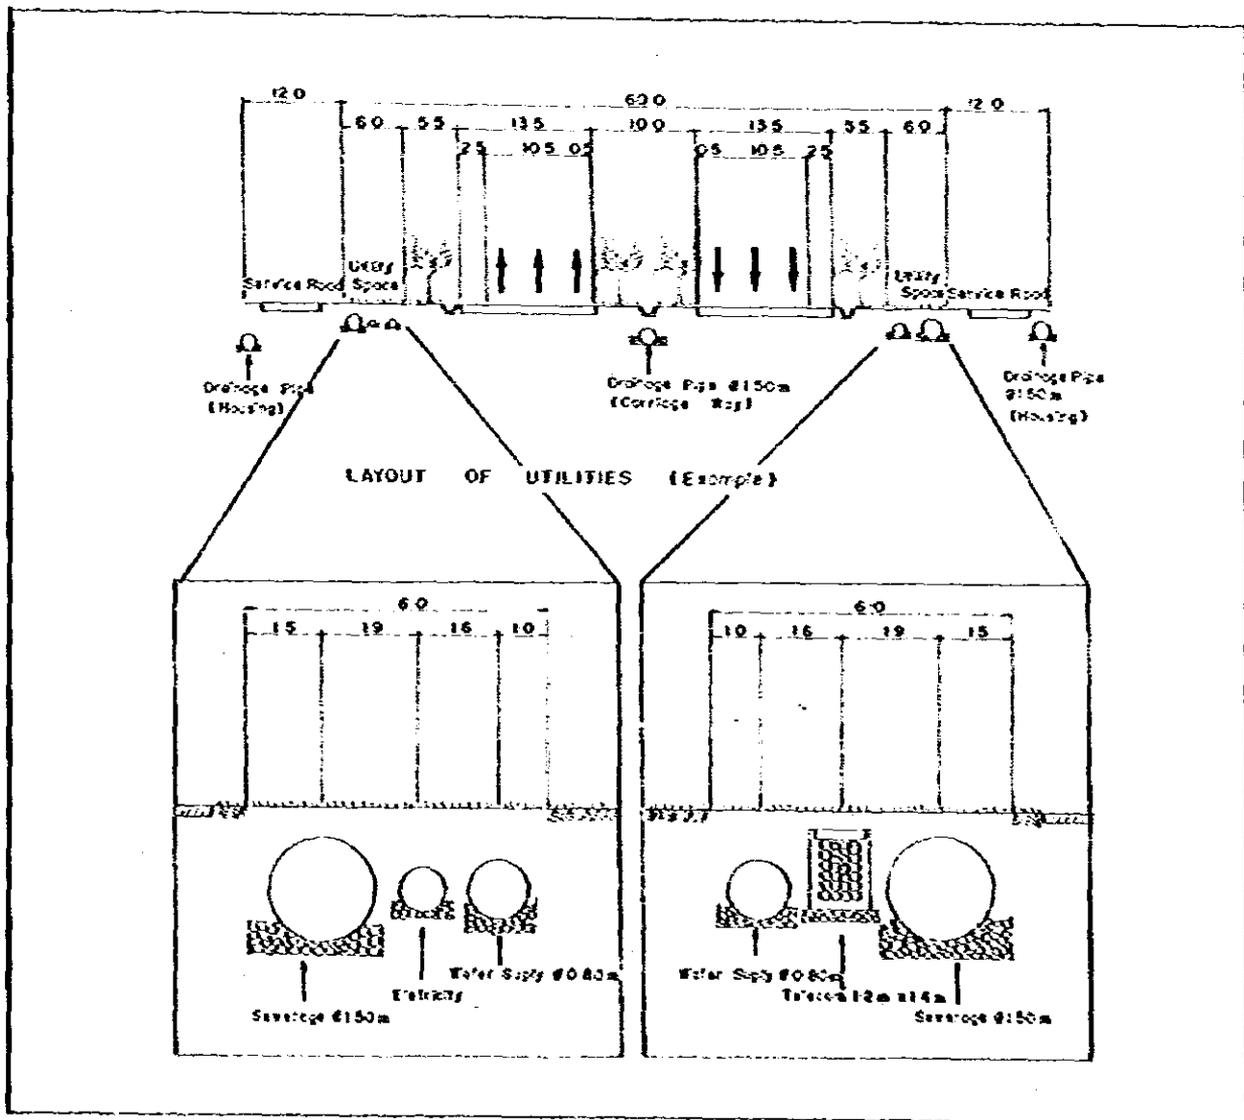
SOUTHERN LINK CROSS-SECTION UTILITY PLAN FOR NEW DEVELOPMENT AREA
